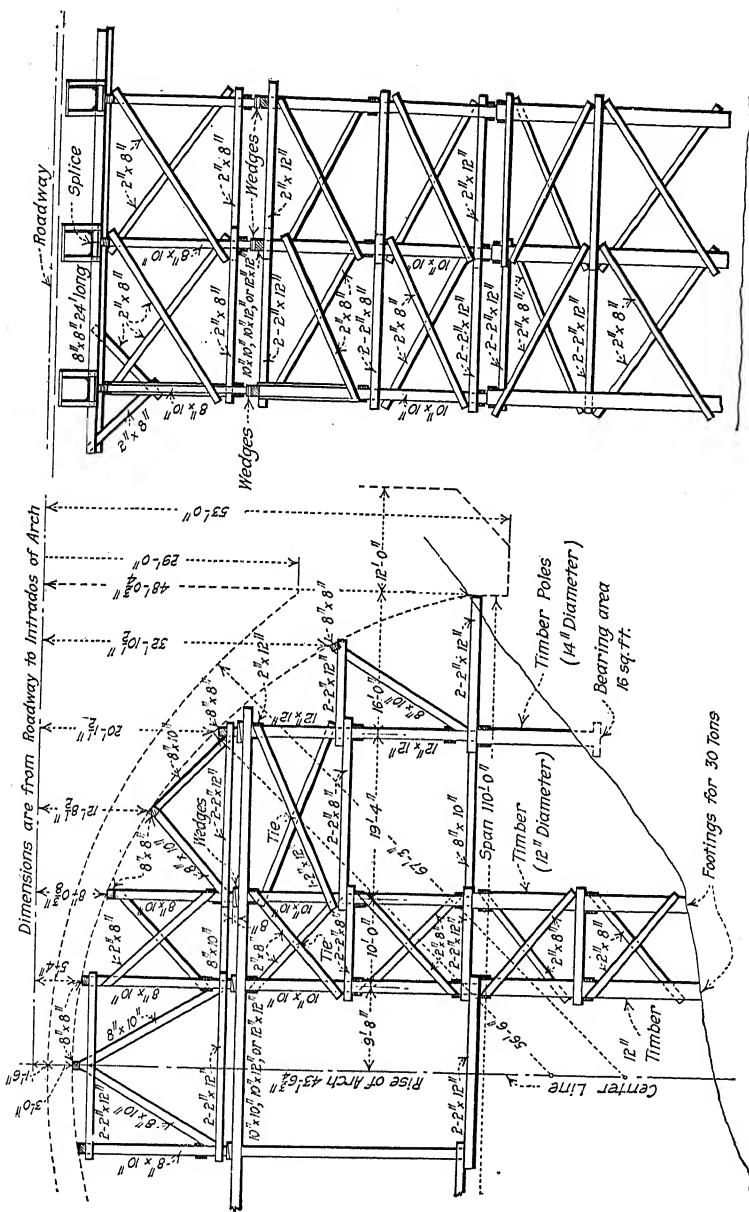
A.—Centering for bridge over ravine on Mississippi River Boulevard, St. Paul, Minn.
